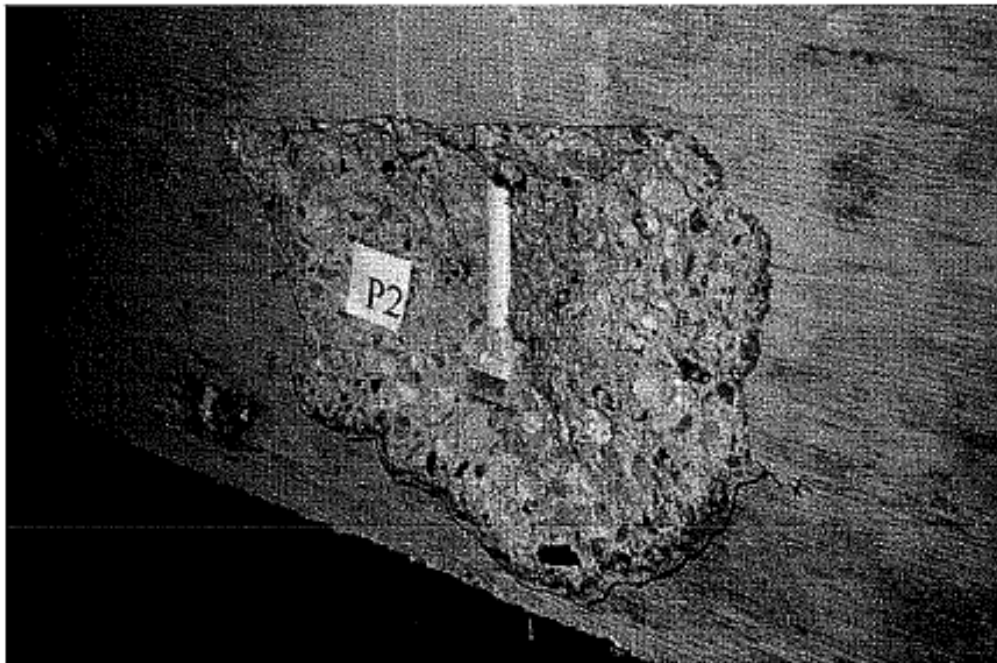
Side-blowout failure in a beam-column joint test (Bashandy 1996)
